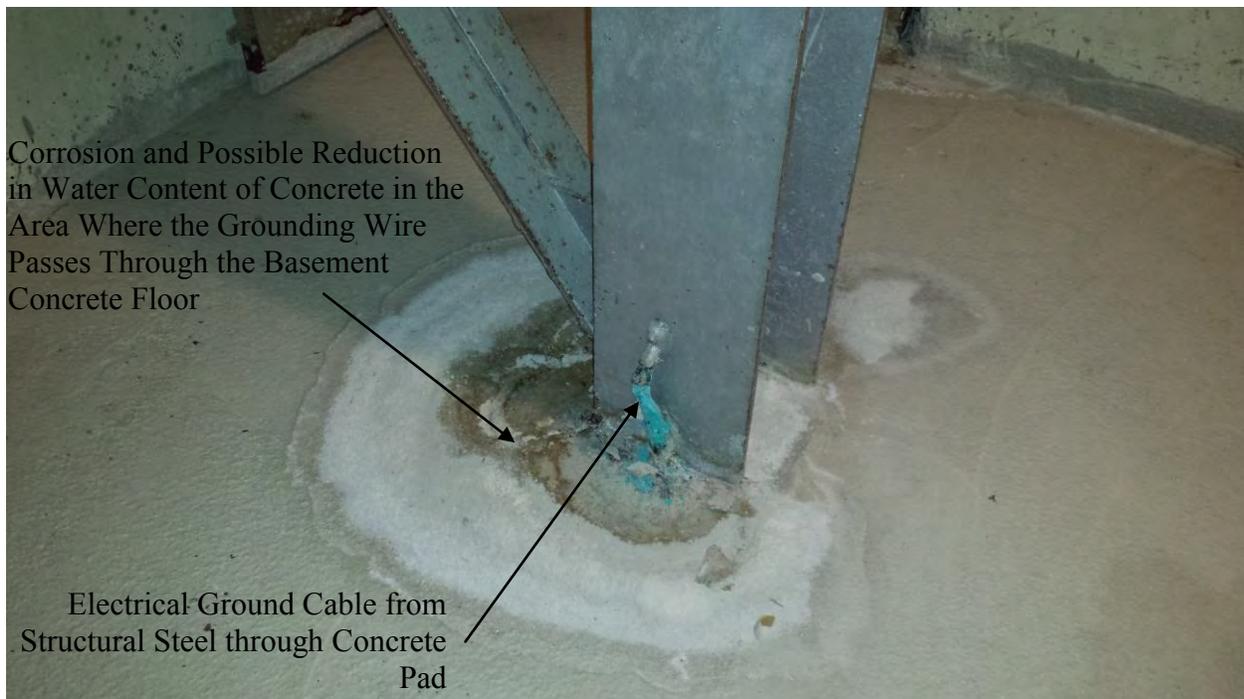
Basement Level – Corrosion Issues on Concrete Floor near Sample Locations 50A and 50B
